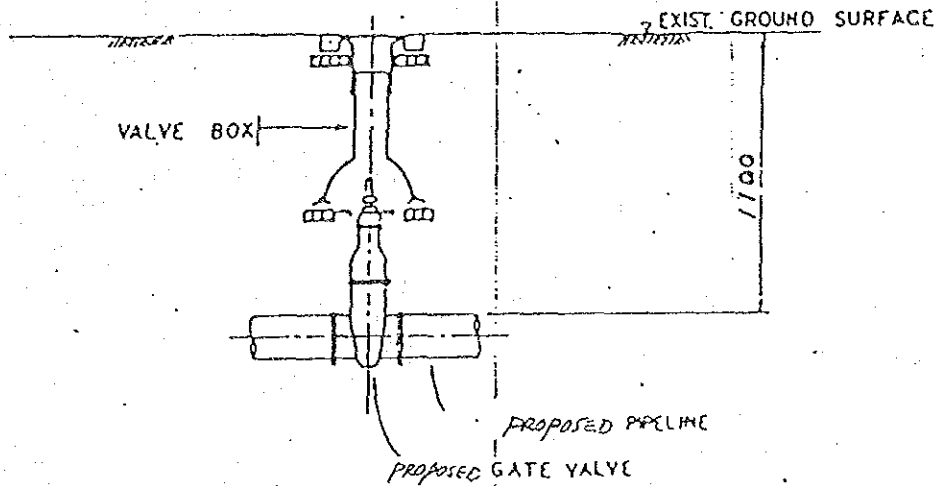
WATER PIPE LINE BESIDE EXIST. CULVERT AT MALAKAL
